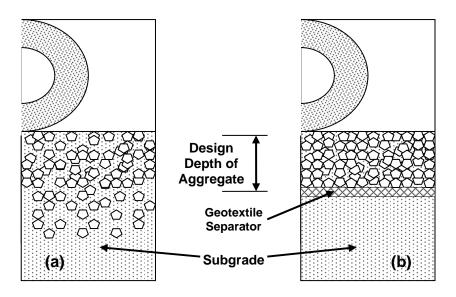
Unpaved road (a) without and (b) with a geotextile separator.
